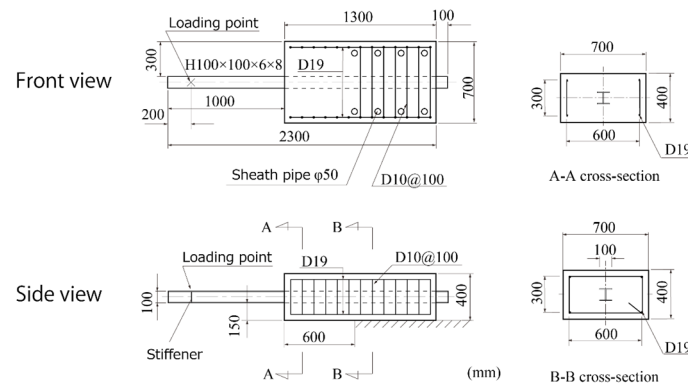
Dimensions of test specimen and rebar arrangement for Post B
